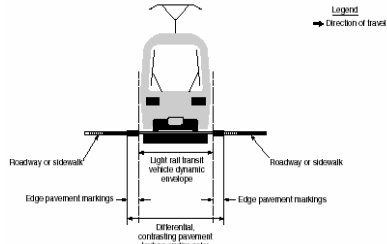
C-8. Typical Light Rail Transit Vehicle Dynamic Envelope Pavement Markings
